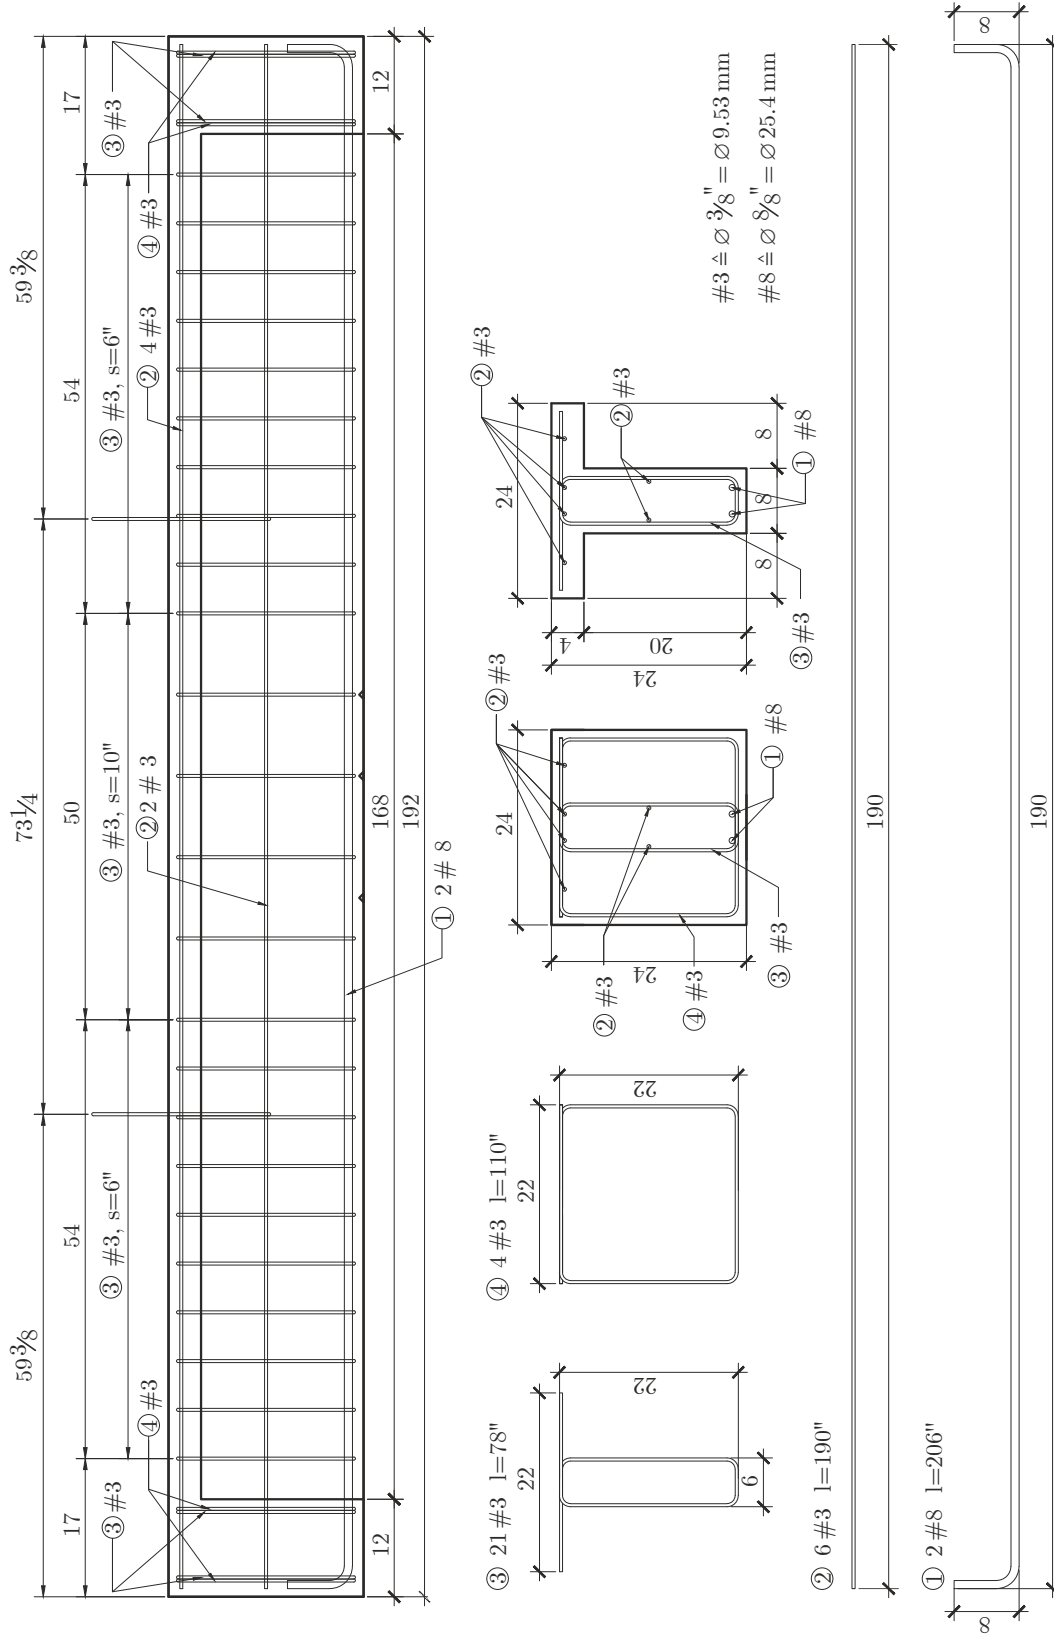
Reinforcement plan of the large T-shaped concrete beam *SnowWhite*. Dimensions in inches (1" = 25.4 mm).
